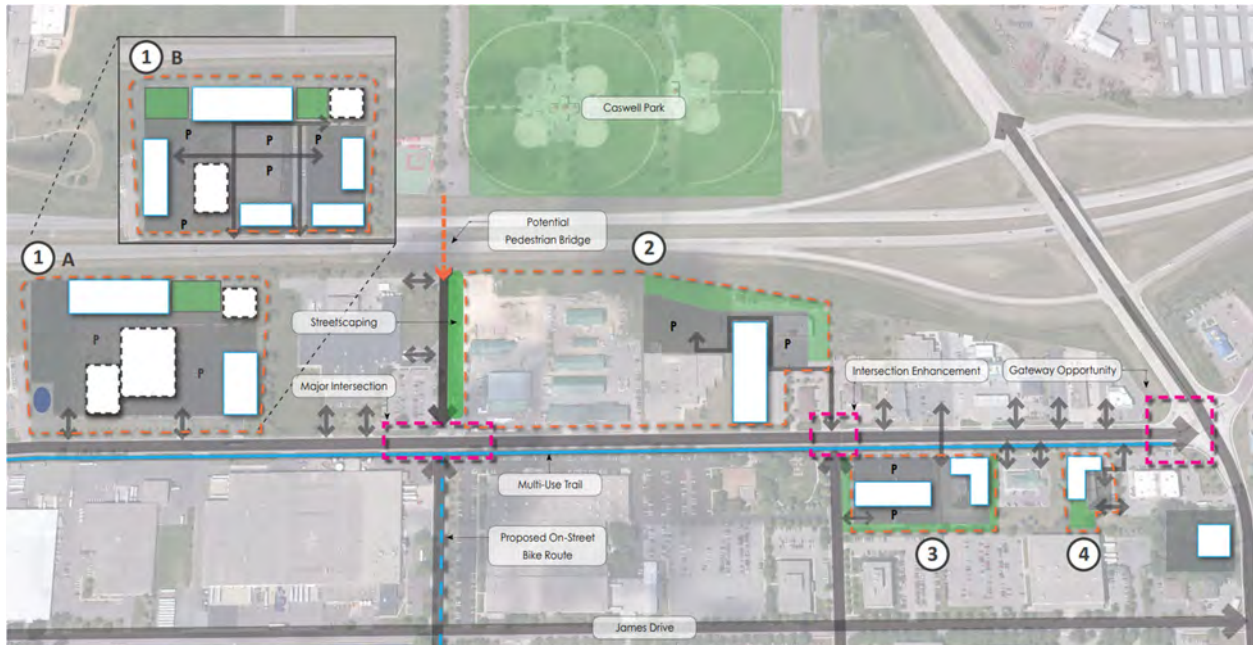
Commerce Drive Improvements Conceptual Plan. Source: Commerce Drive Area Development Plan (2018).
